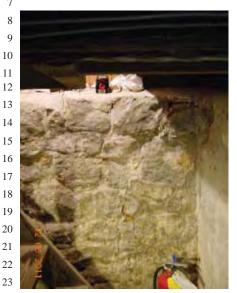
Basement wall crack, PD 12/6/11
